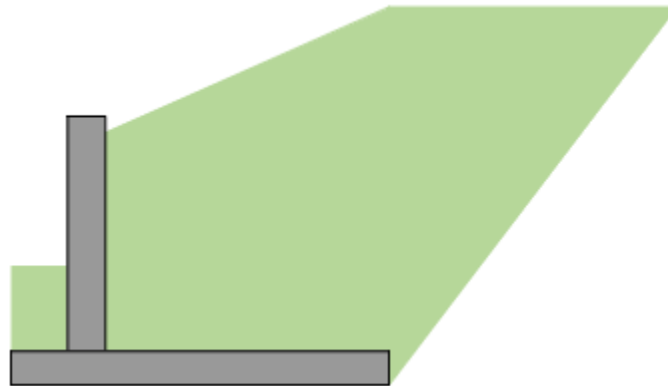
Wingwall Geometry Including Active Soil Wedge
